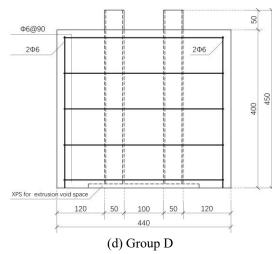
Sections of Foam Concrete Specimens and C-Channels (XPS – extruded polystyrene to provide extrusion cavity, all dimensions in mm)
